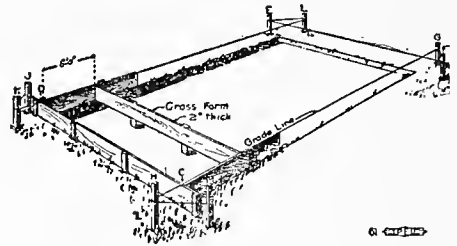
Form for Feeding Floors and Barnyard Pavements.
